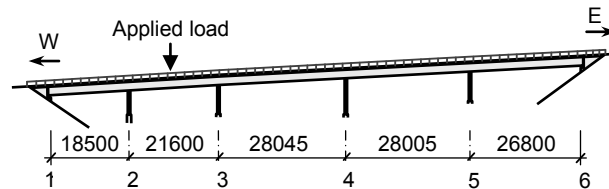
Elevation of the Kiruna Bridge with span lengths (mm) for the southern span.
